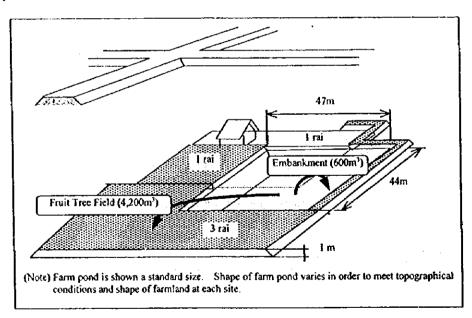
Residual Soil Disposal Plan for a Large Farm Pond (6,000m³)
